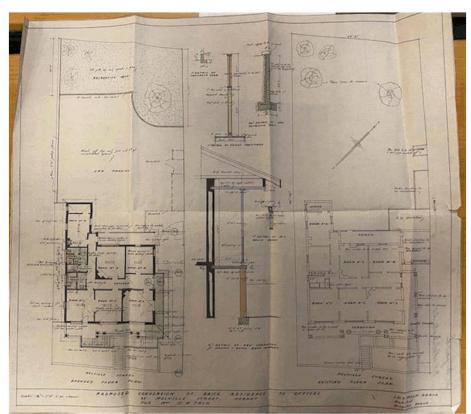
Architectural Plans for 1965: Note removal of part of the front wall and details of column removal (TAHO: building application record 20133)
